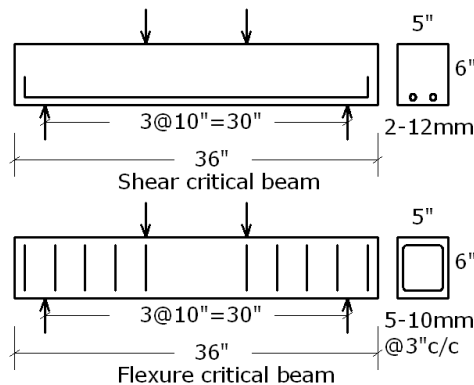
Beam dimensions, loading and reinforcement detail of shear and flexure critical beams.
